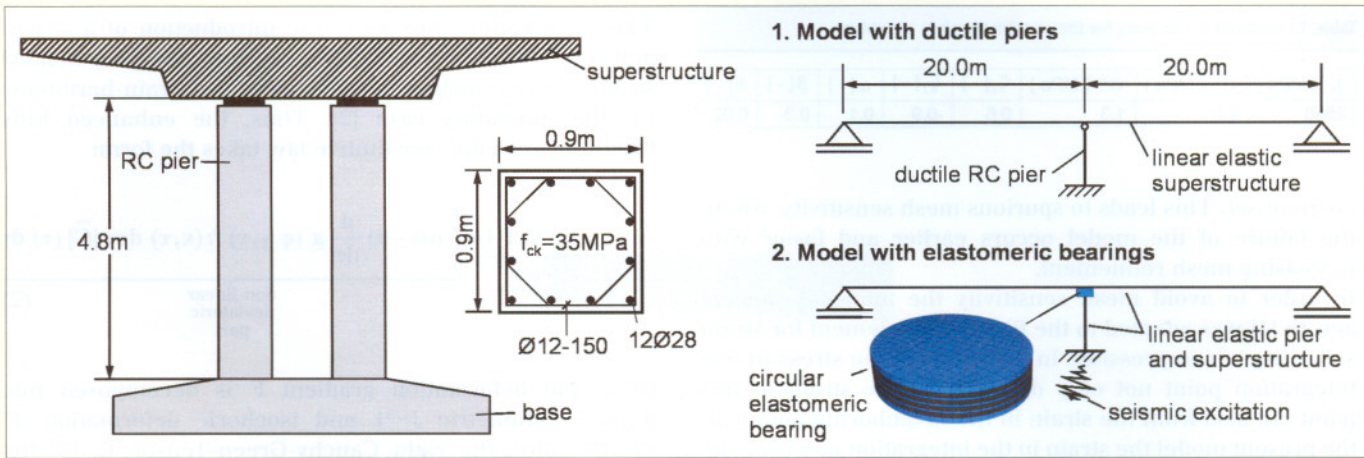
Girder bridge with RC pier cross section and the two FE-models
